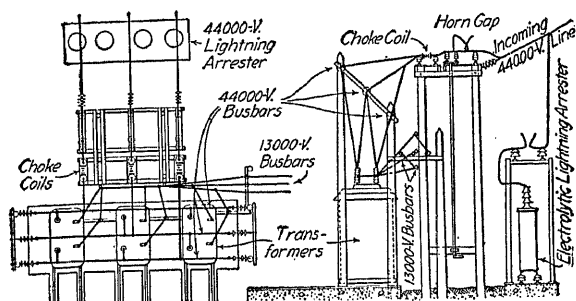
Arrangement of 2250 Kva. Outdoor Substation Equipment
